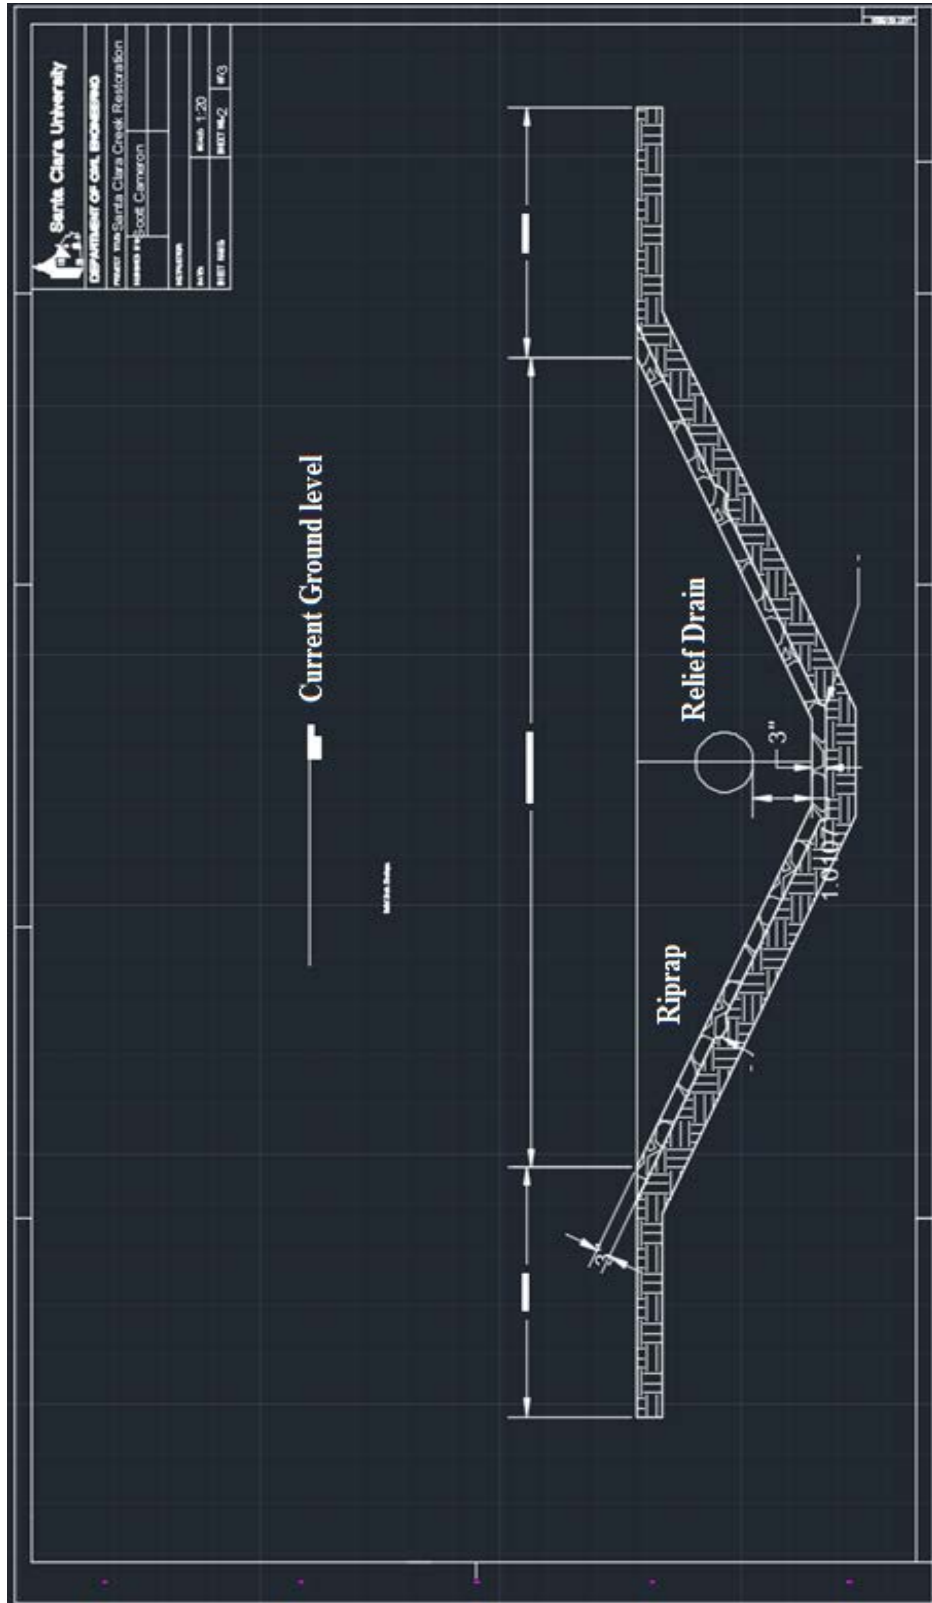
1:20 scale stream cross-section, showing current ground level and water table.
